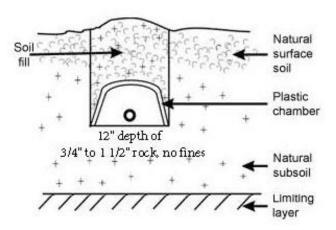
Typical Leaching Chamber Installation; Cross-Section
